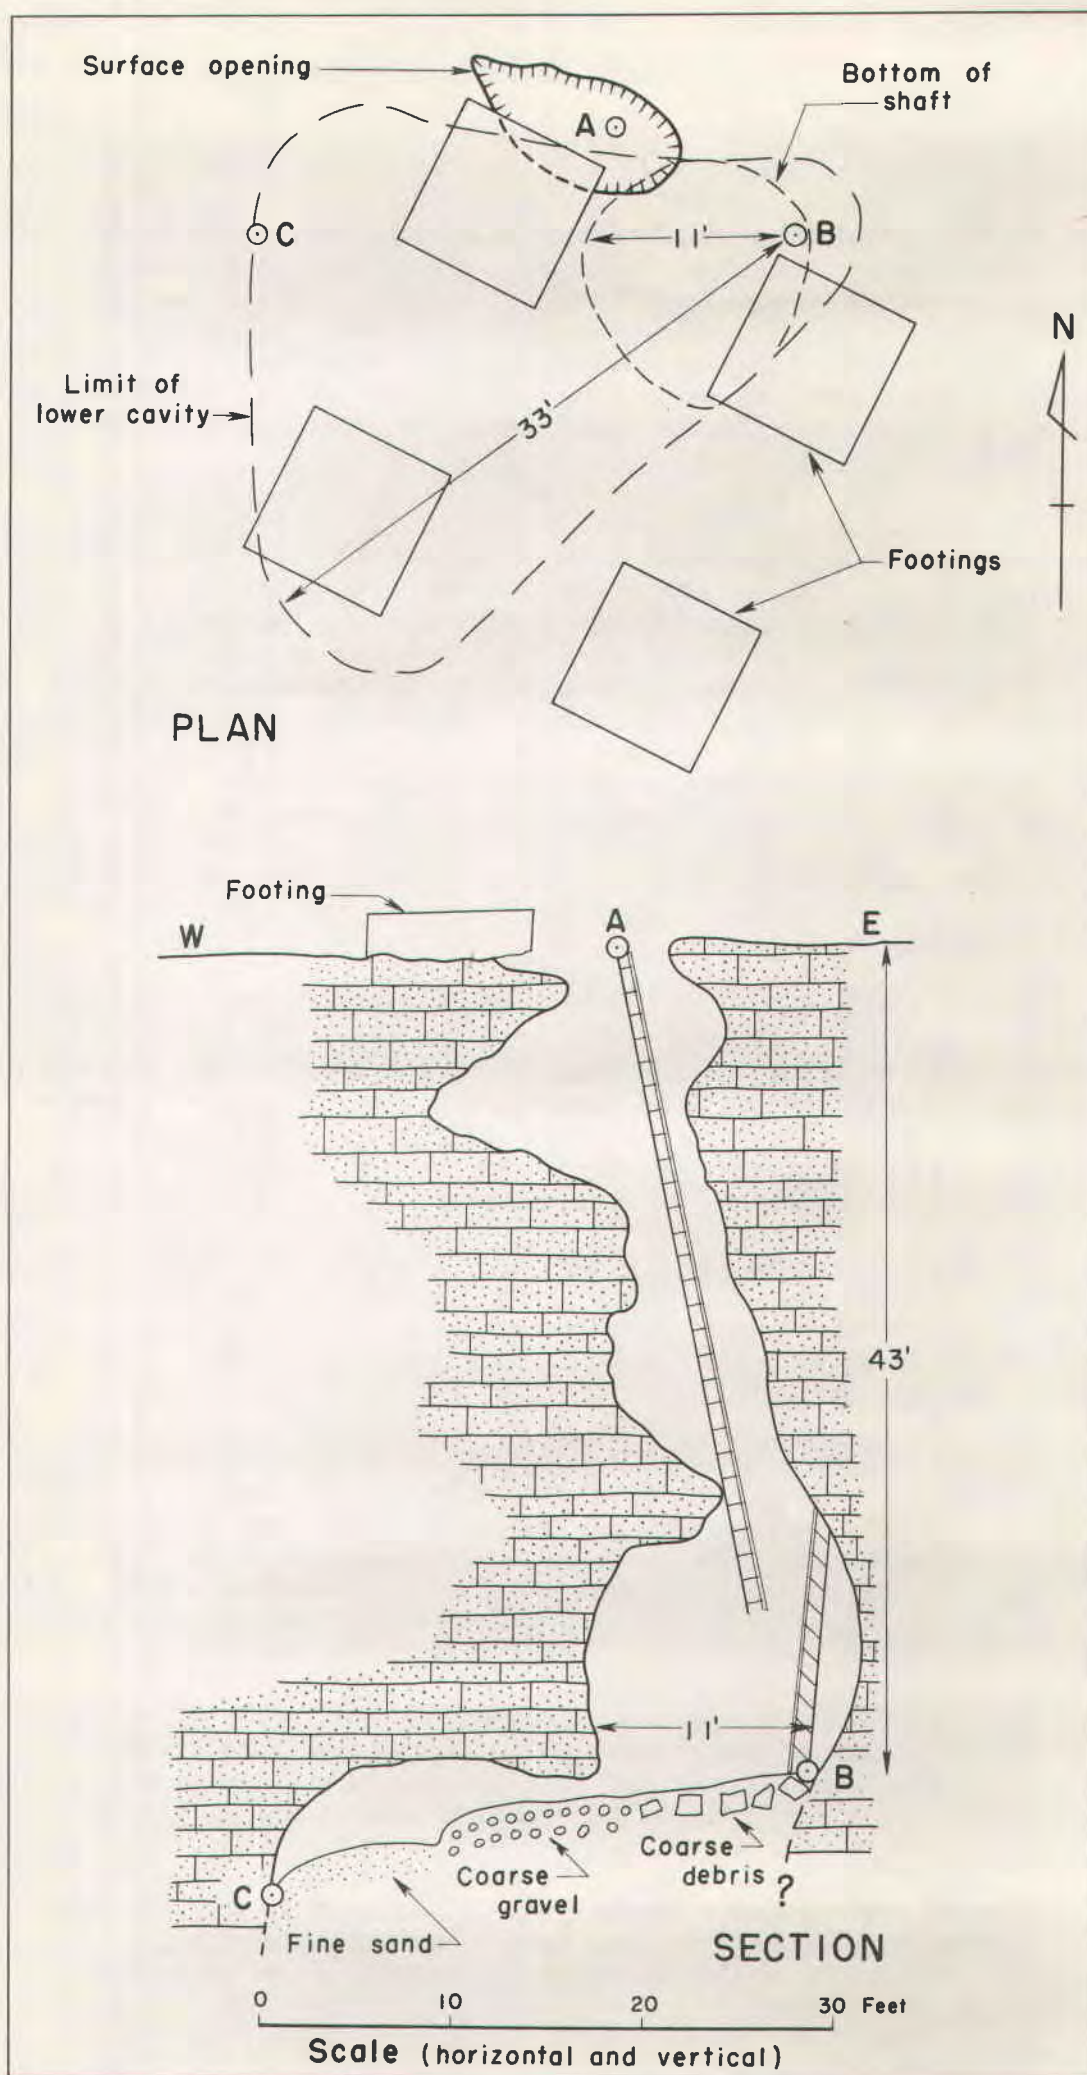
Plan and nearly vertical section (through A, B, and C) of cavern under footing of new Navy Hospital. A and B are at top and foot of ladders; C is at west side of lower cavity.
